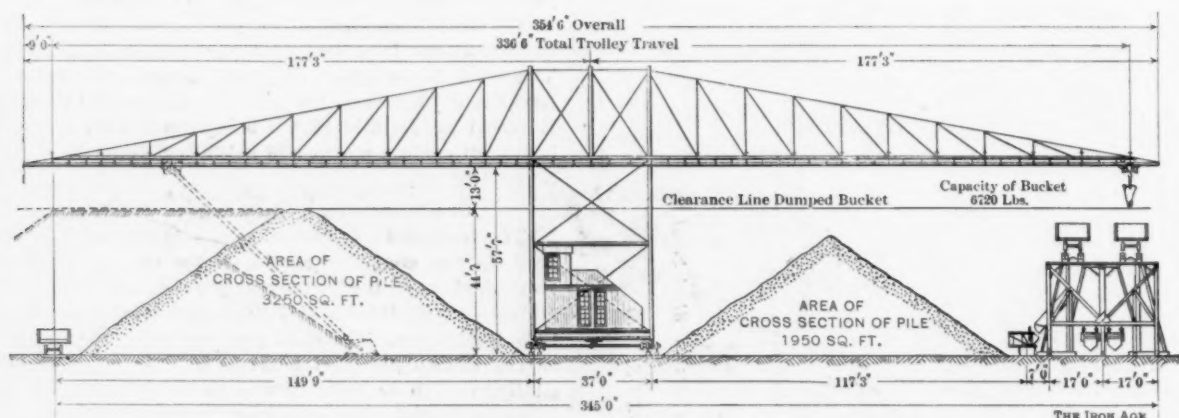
Side Elevation of the Brown Cantilever Crane Hoisting and Conveying Machinery.
